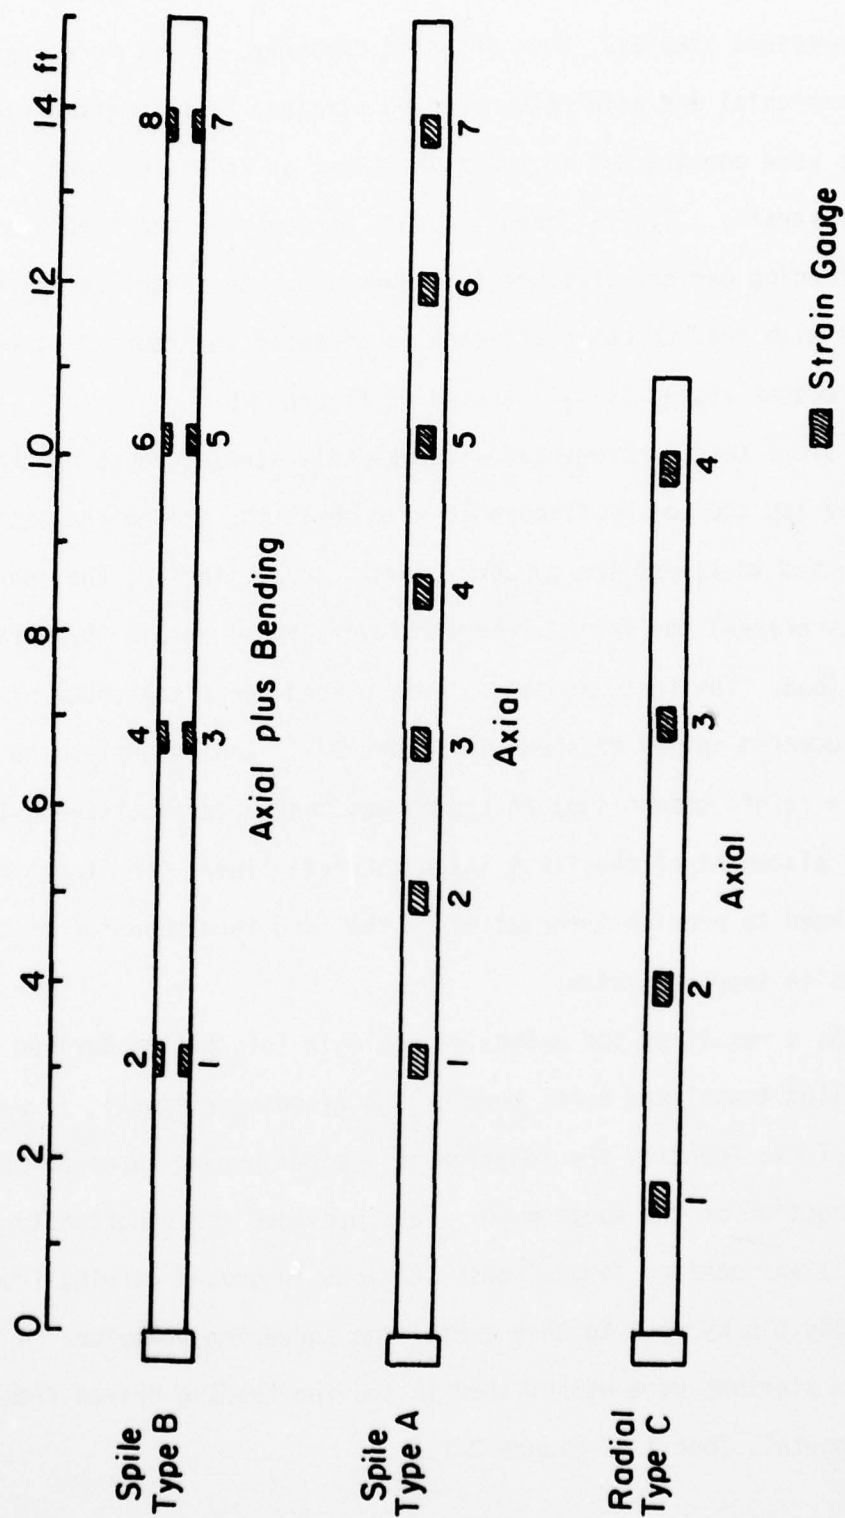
Instrumented Reinforcement Bar Type and Strain Gauge Positions
